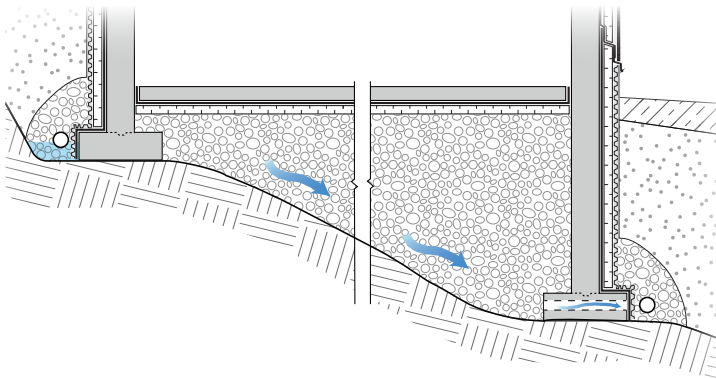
Weep holes through the "downstream" side of the footing can be used as a drainage pathway from the underslab area to the foundation drainage system.
